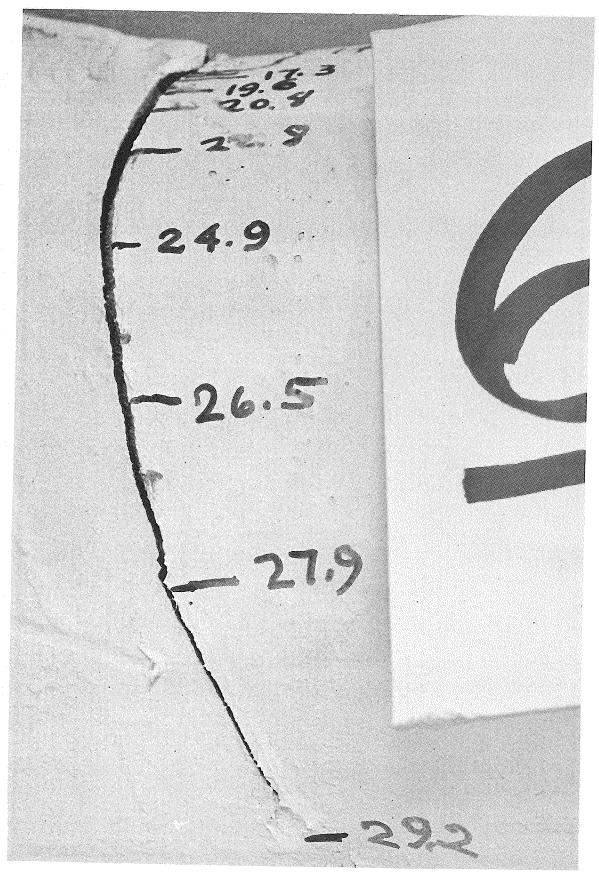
JOINT TYPE 3 - SPECIMEN No. 6 (TAPERED GUSSET PLATE) DETAILED CRACK PROPAGATION IN DIAGONAL MEMBER
